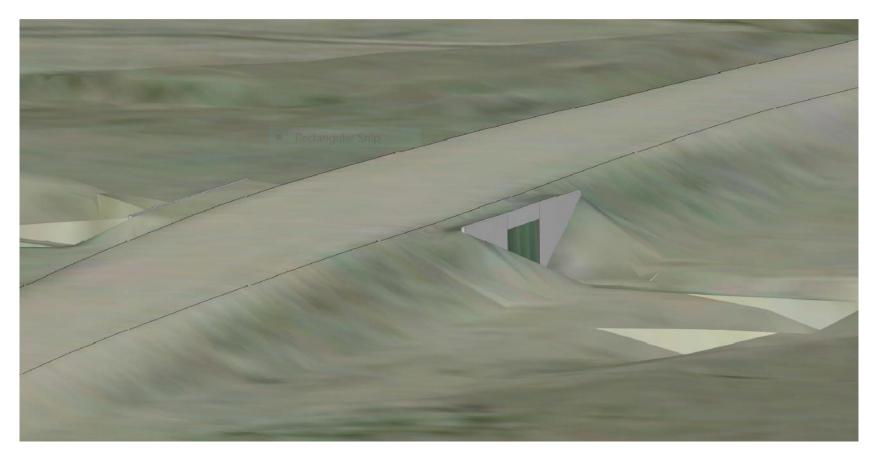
3D simulation of what the downstream side of the new box culvert at Krier's Creek would look like, view to the southwest.
